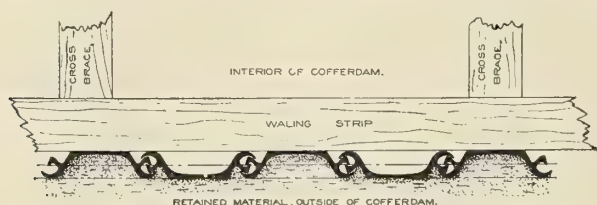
TYPICAL SECTION OF WALL OF LACKAWANNA ARCHED WEB STEEL SHEET PILING
